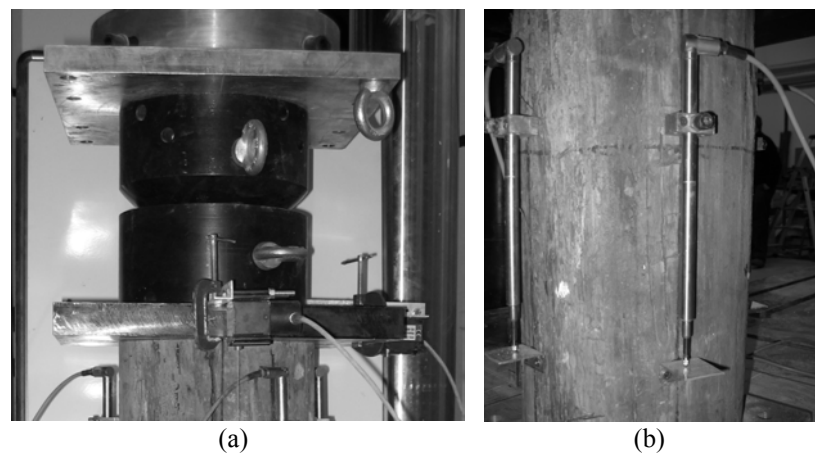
Testing equipments used for compression tests: (a) spherical hinge at the top-end of the specimen; (b) LVDT transducer placed on the sample.
